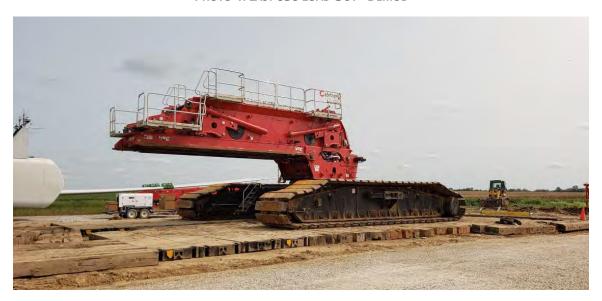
LAST 650 LOAD OUT - DEMOB
